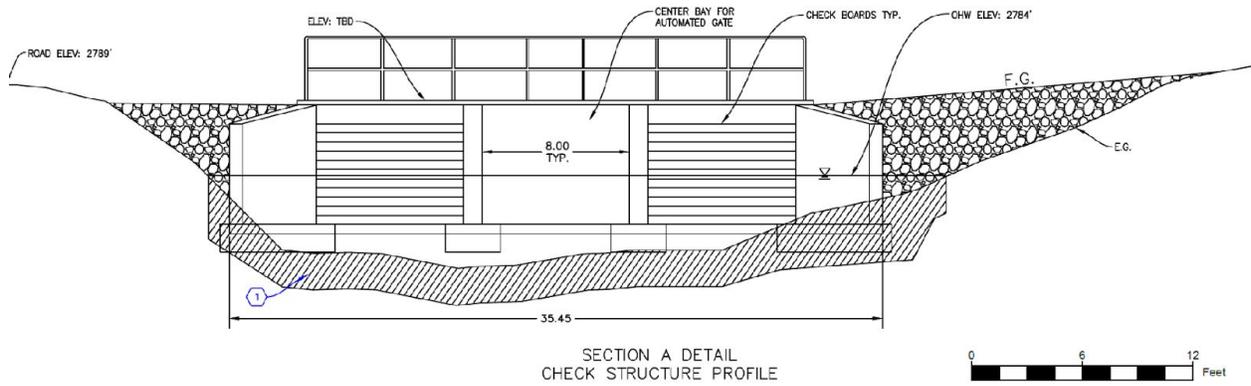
Section Detail of Diversion Structure (draft by SPF Water)
